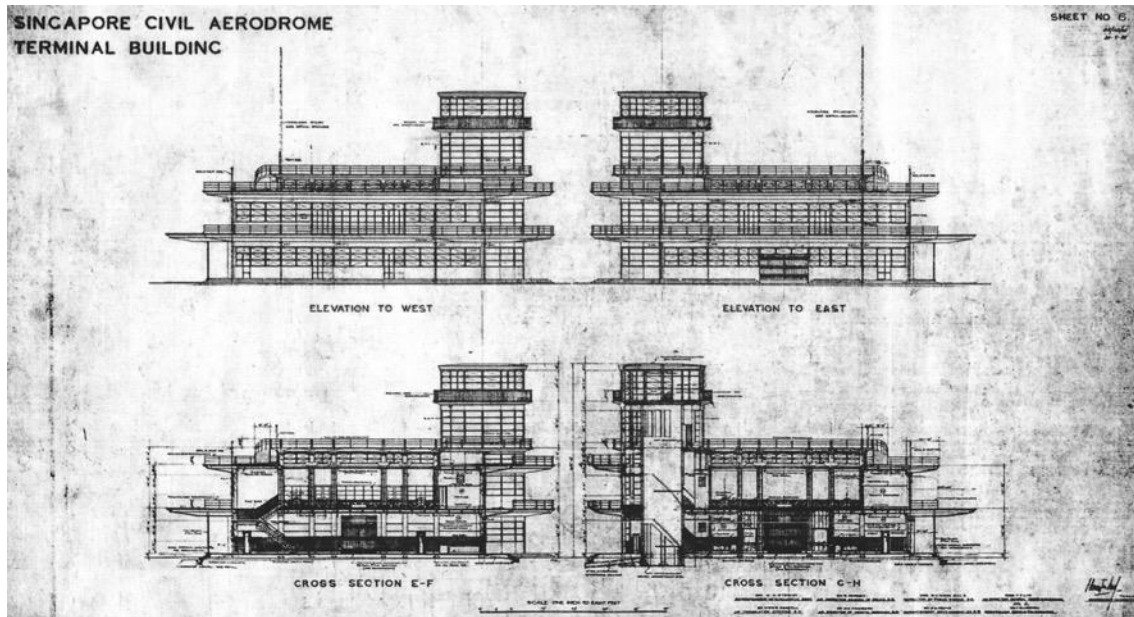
Frank Dorrington Ward. Elevation and section drawings for the Kallang Aerodrome. NAS NA 186.
